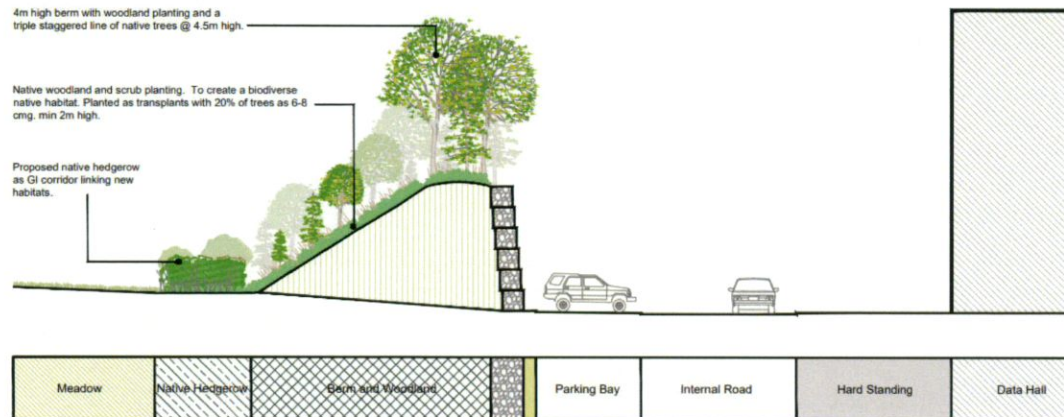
Extract of KFLA's landscape gabion wall screening detail.
